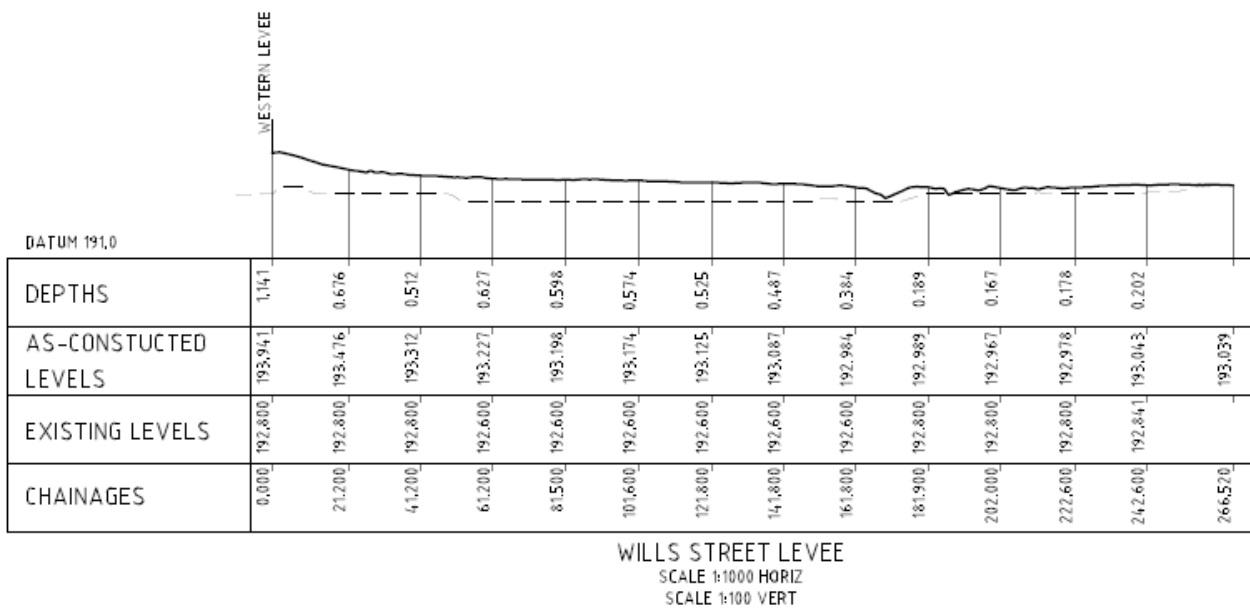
Longsection of the supposed Wills Street Levee (Engeny 2024)
